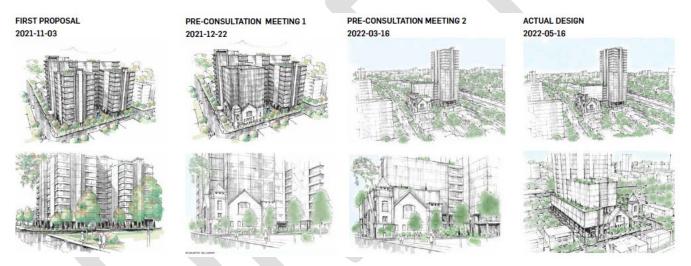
Design Evolution of proposed building from original bulky bar building (left) to slender point tower (right).
